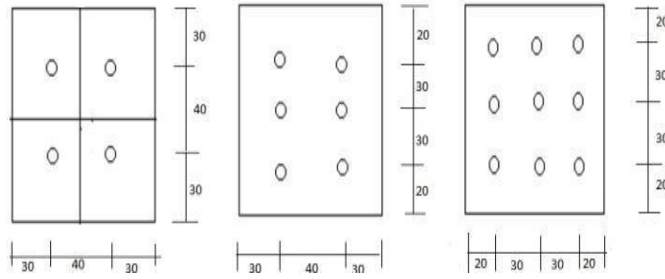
Arrangement of piles in piled raft foundation (unit: mm)
